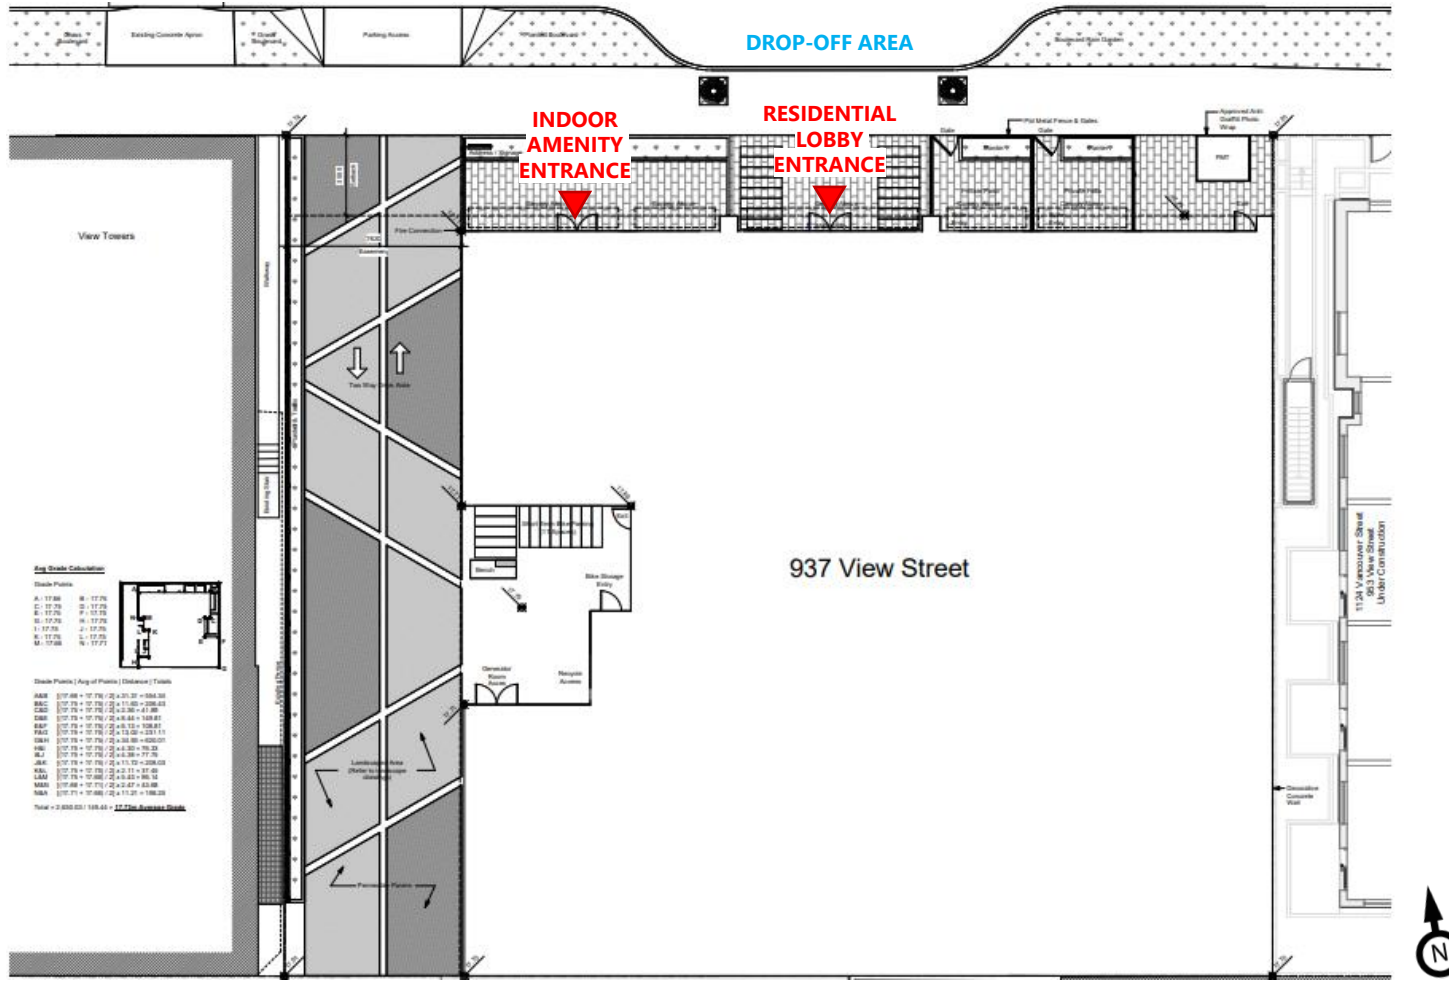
Site plan highlighting the location of building entrances and drop-off area on View Street
